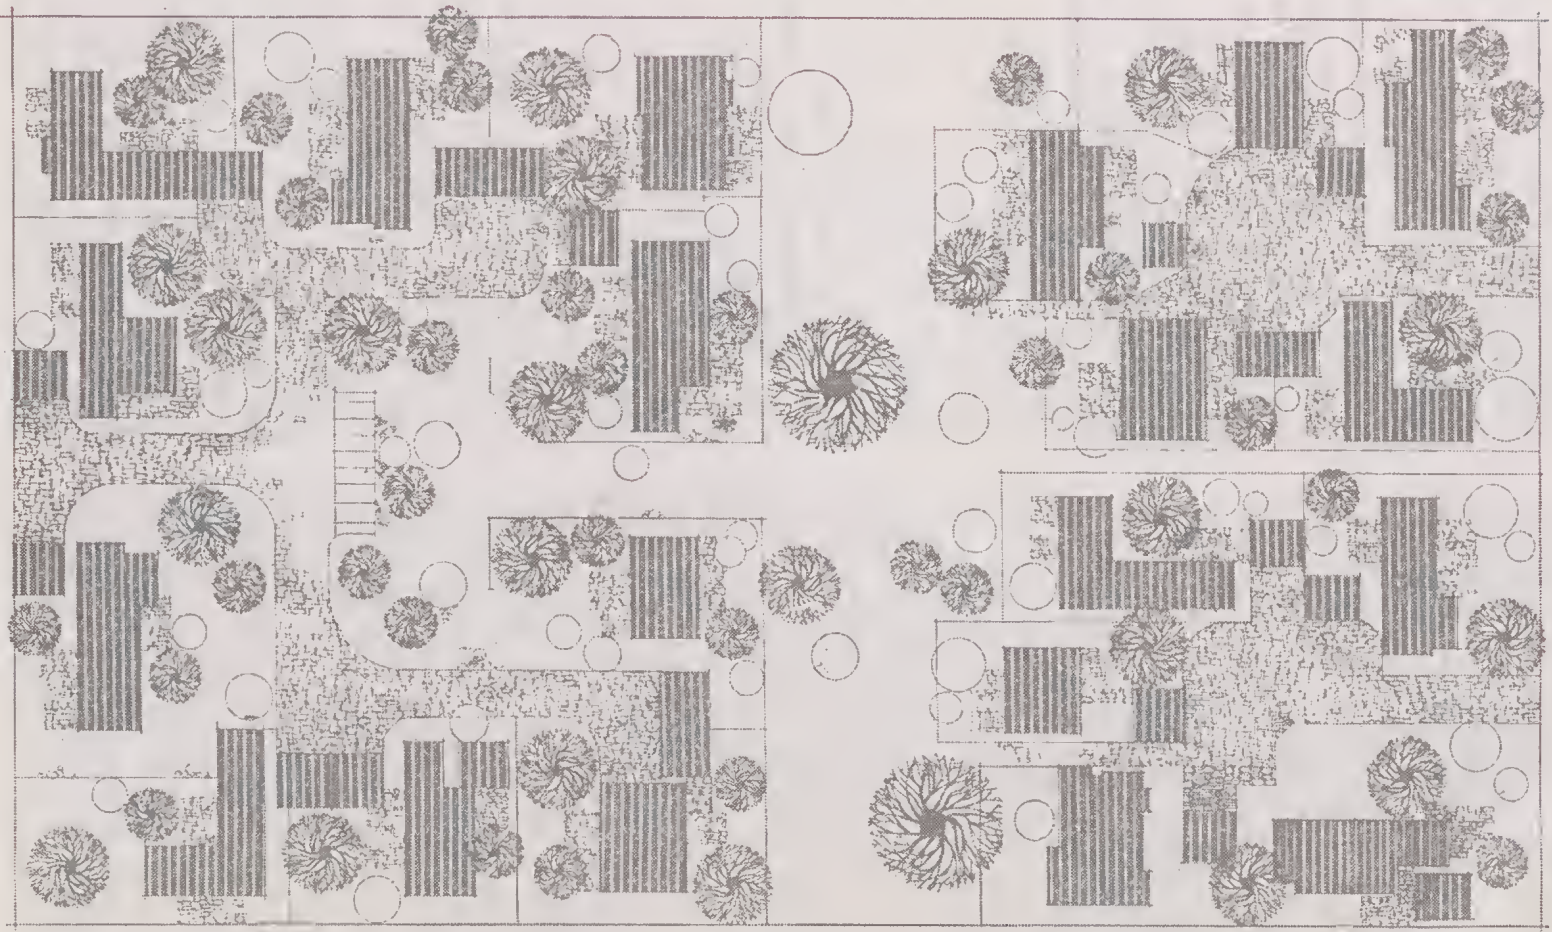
Winter Park, Doncaster, Victoria: Layout of cluster plan. 20 houses on 4.3 acres.
